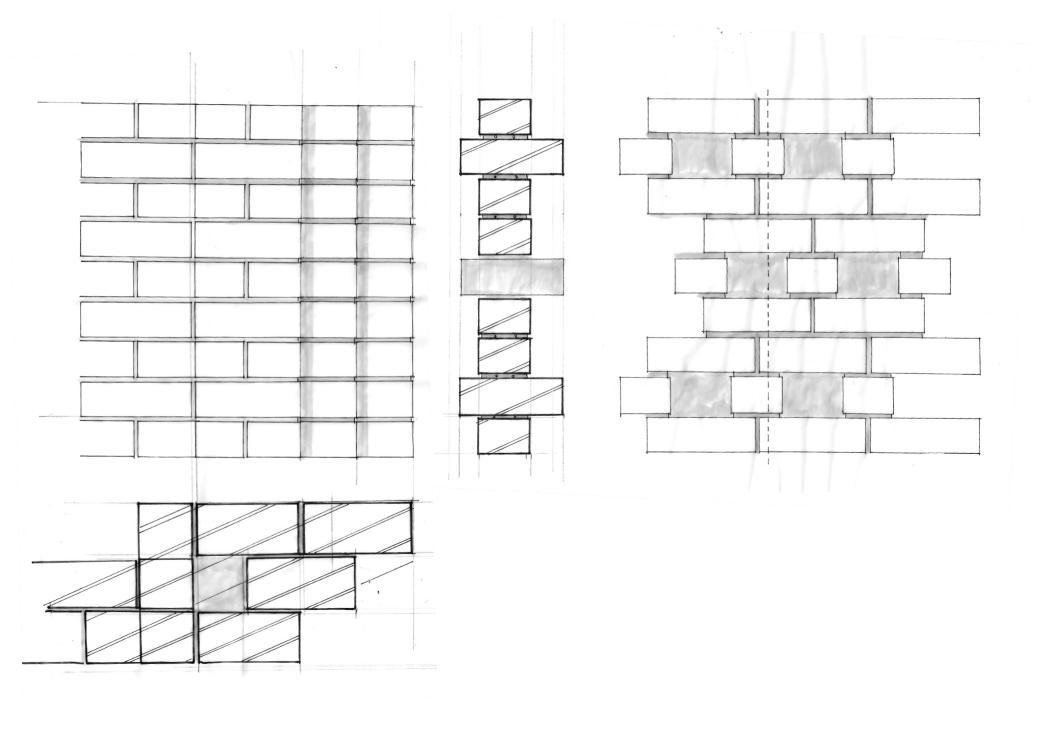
Plan and elevation of the connection between the wall and the screen
